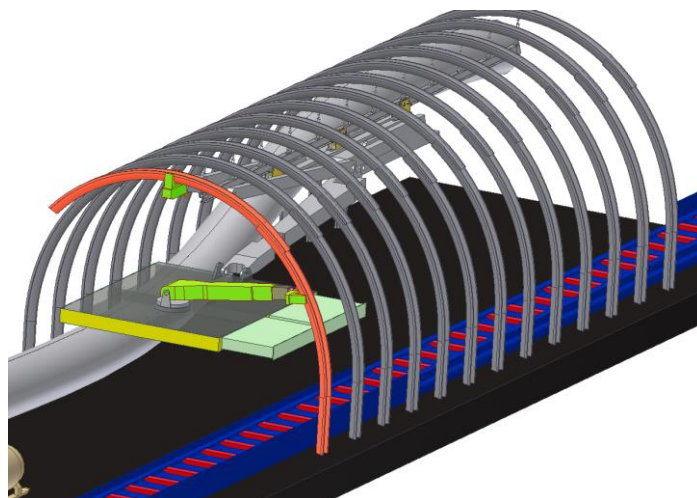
Model of a platform for erecting a permanent arch support behind the roadheader
